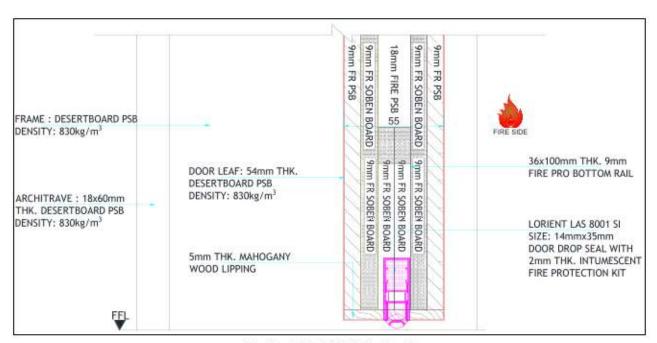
Detail D of drawing 4). (Drawing provided by the test sponsor)
